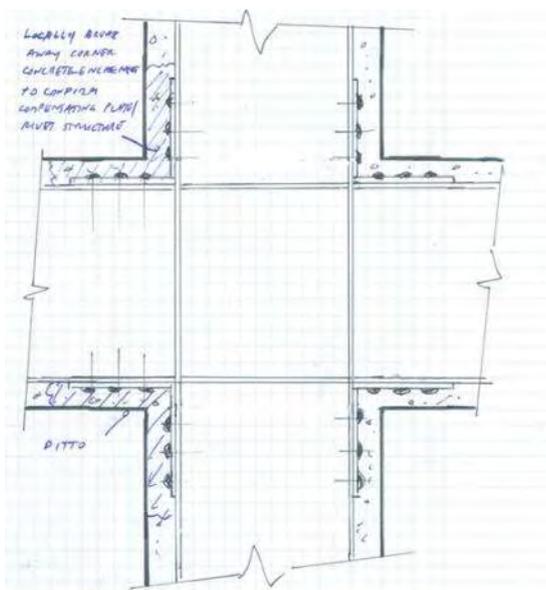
Configuration of existing column-beam connections if constructed as a fully-welded frame
